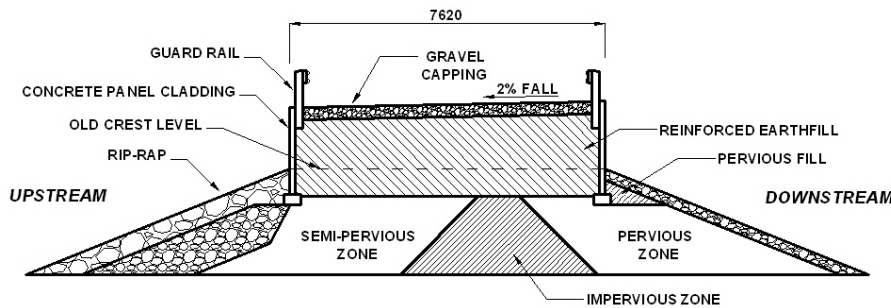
Kromellenboog Dam: Typical Detail of MSE Crest
